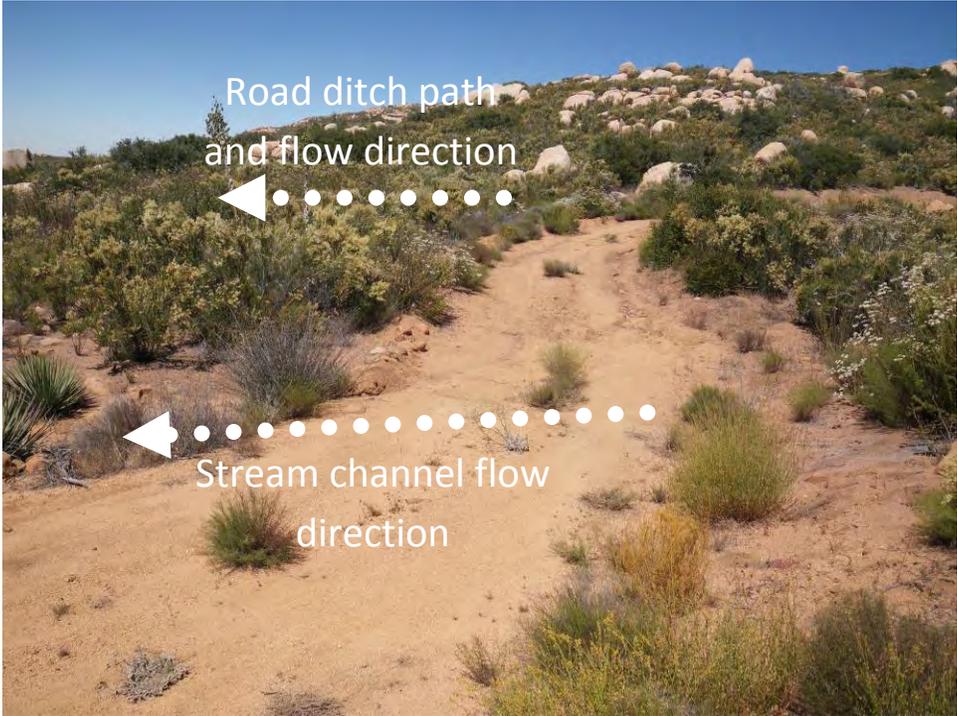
At Site 2 looking at the lower-most road crossing of the stream channel that drains to the southwest meadow. The road ditch is also shown here.
